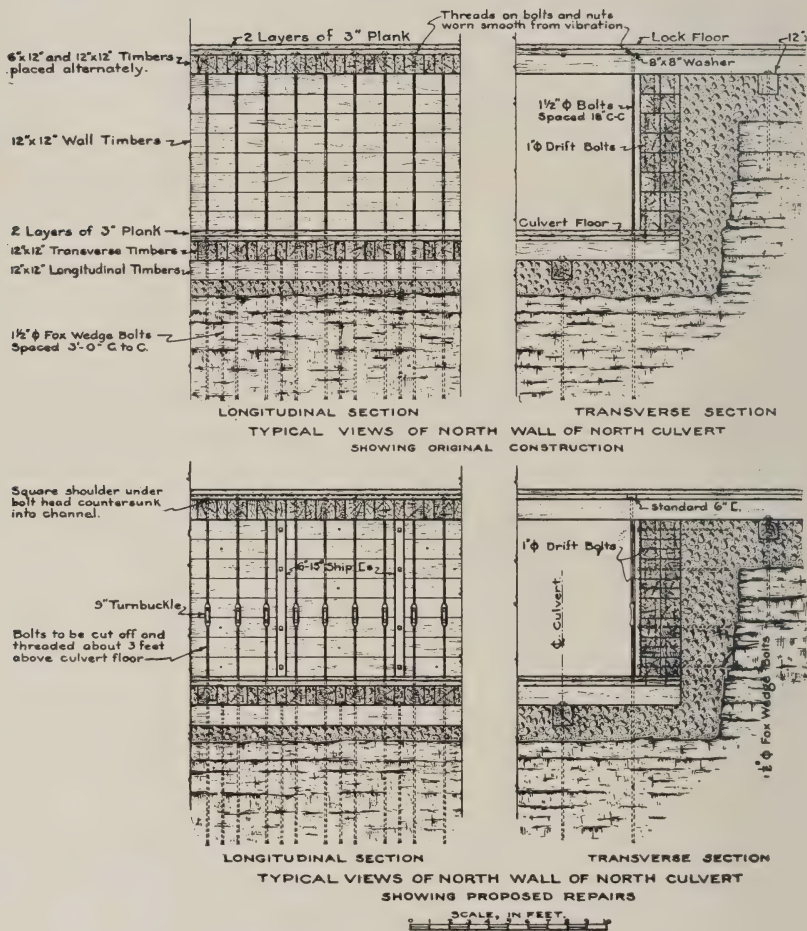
Filling tunnel at Poe Lock, St. Marys Falls Canal.
